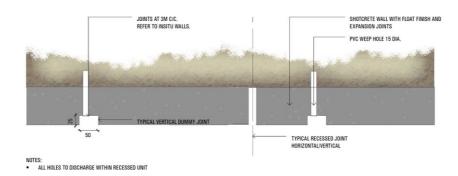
Typical Plan: Weephole and vertical joint for shotcrete finish wall / cutting (2:1 vertical face cut)
